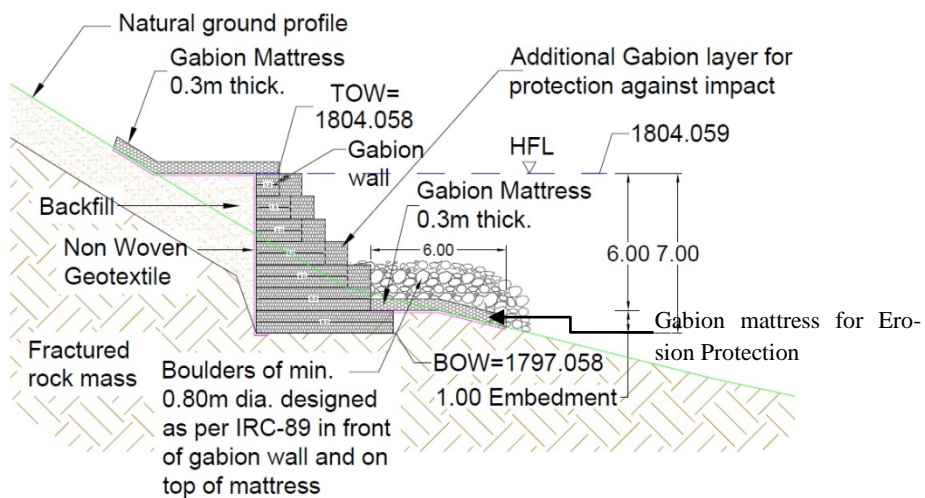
River-side Gabion Wall for bank protection(schematic sketch, not to scale) Note:
